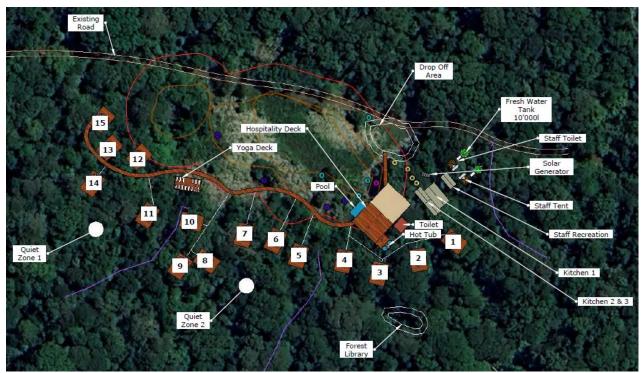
Conceptual camp layout indicating proposed infrastructure.
